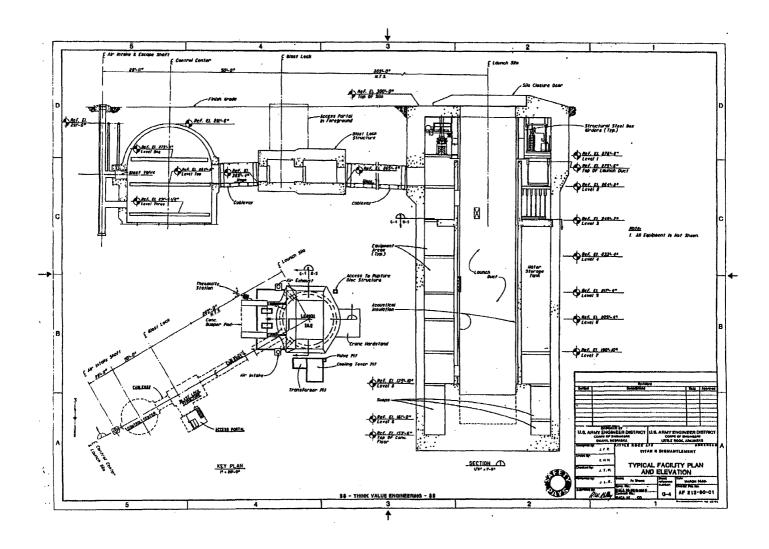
Typical Titan II Launch Complex Facility Plan and Elevation
